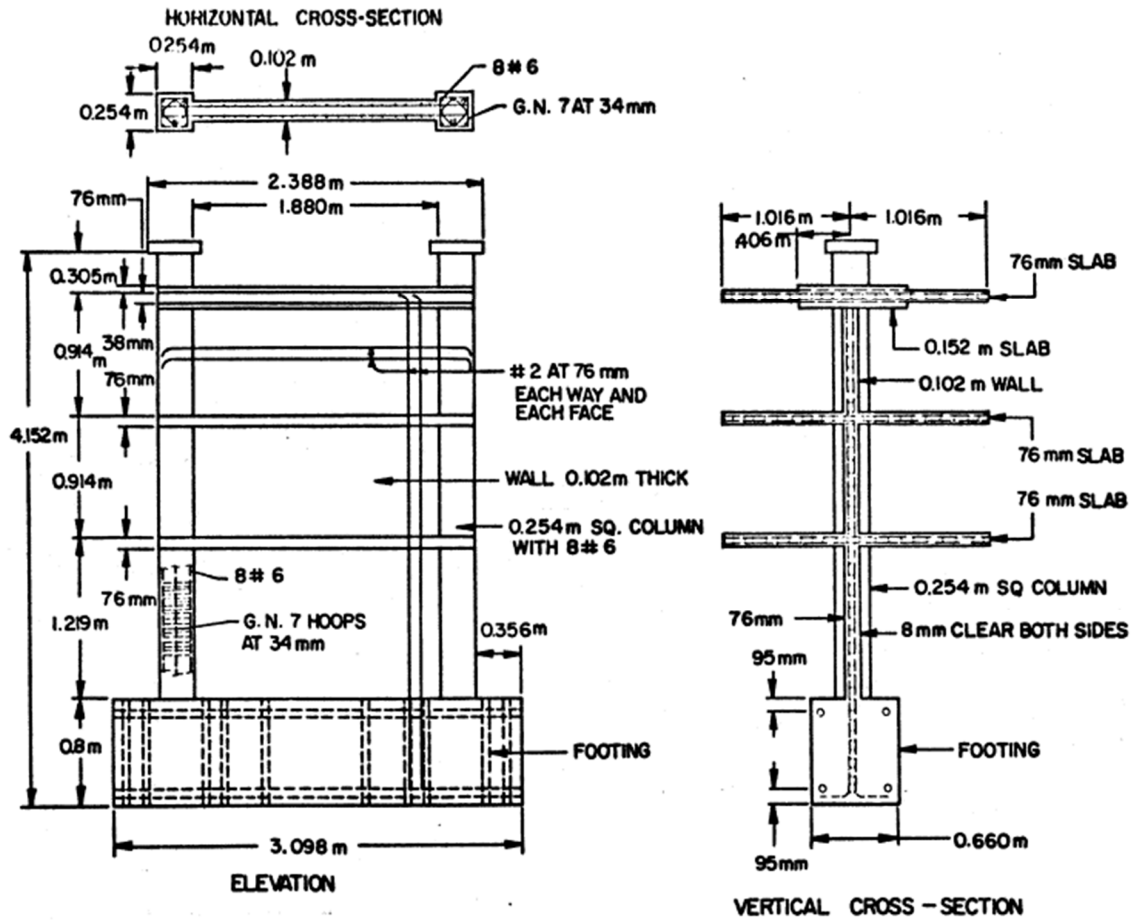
Dimensions and Details of Framed-Wall Specimens (Vallenas et. al. 1979)
